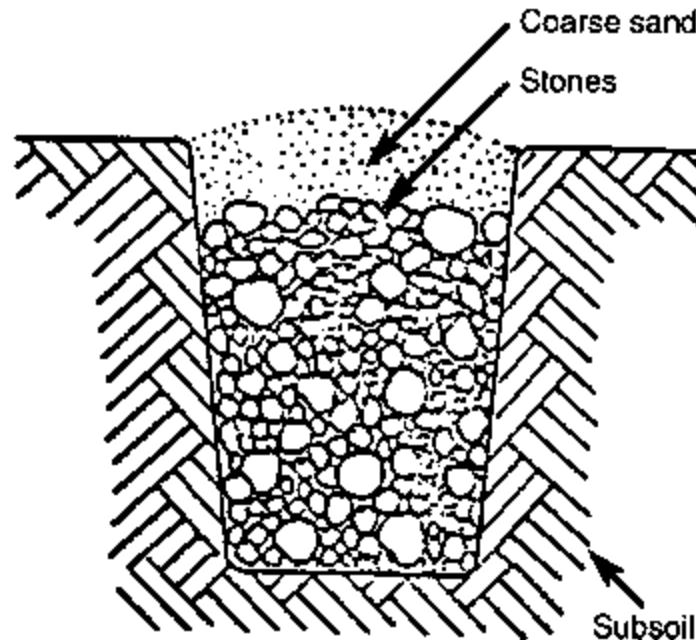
Cross-section of a simple subsurface drain: a ditch filled with a layer of stones covered with coarse sand (130).
